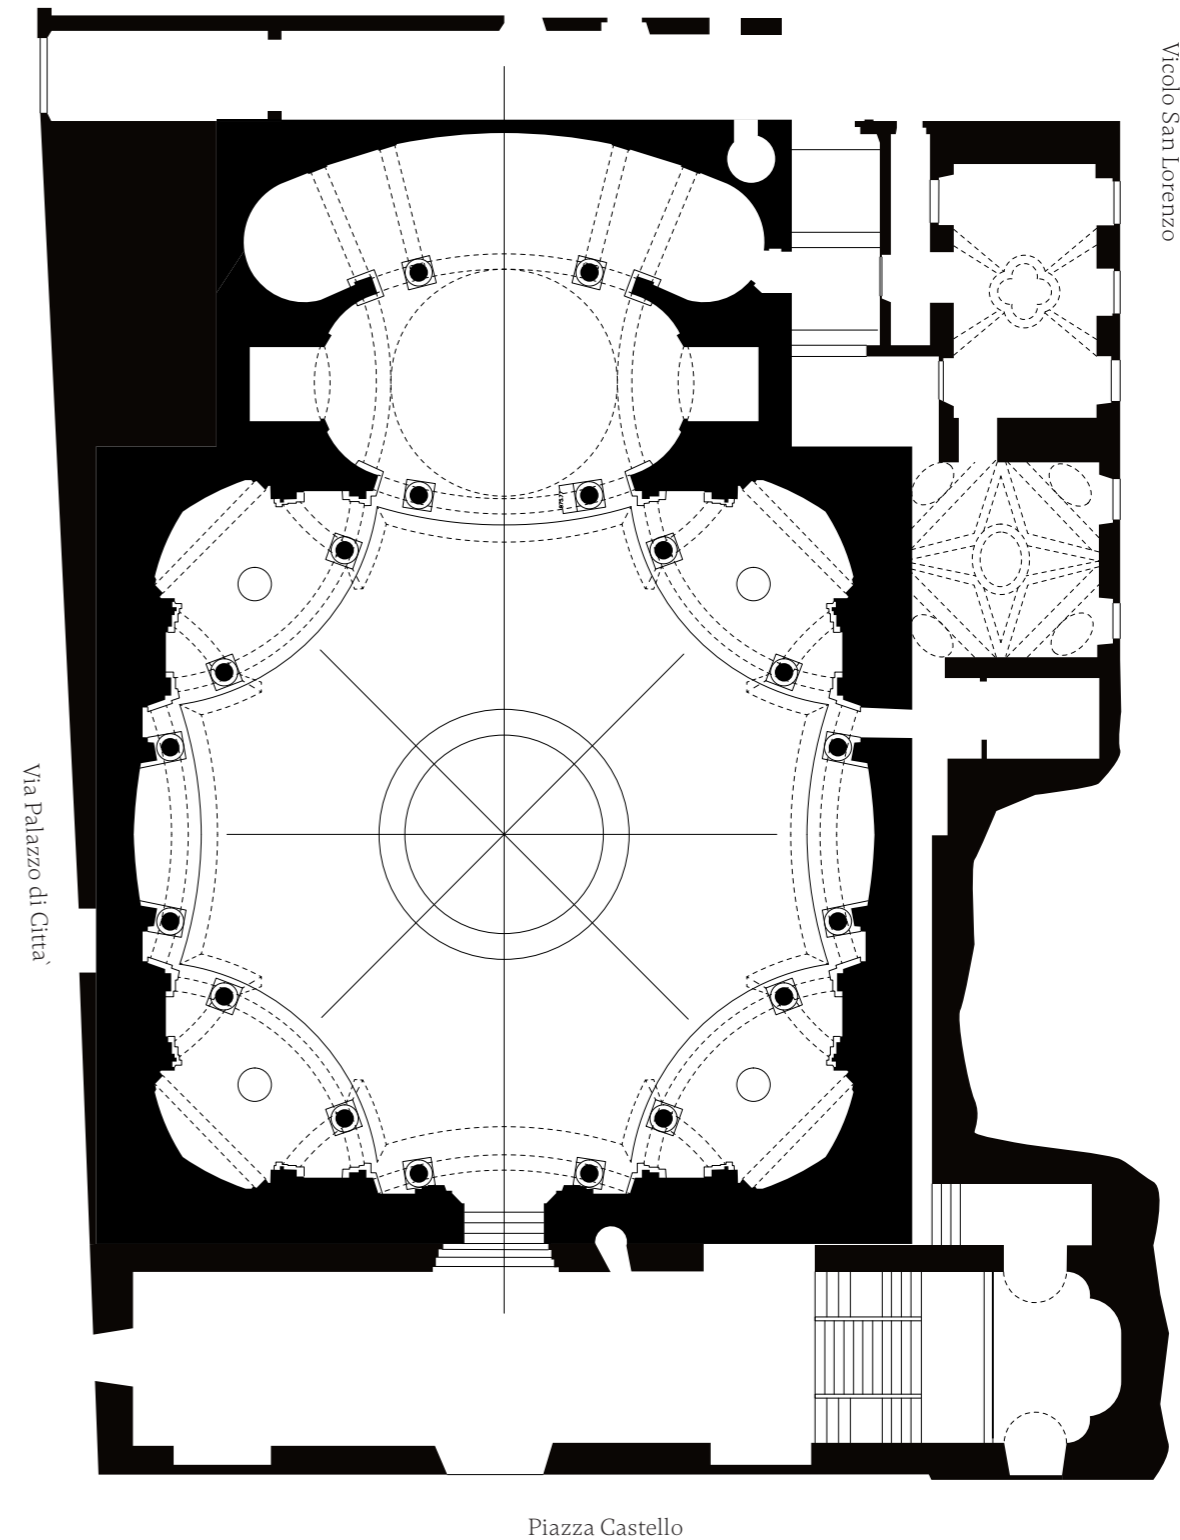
San Lorenzo, simplified ground floor plan with surrounding structures, scale 1:200.
